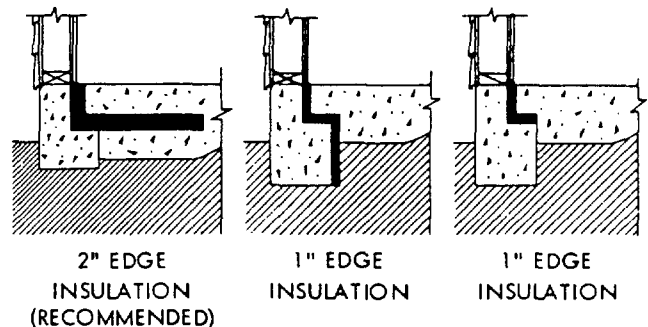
Examples of Edge Insulation Around Floor Slabs
